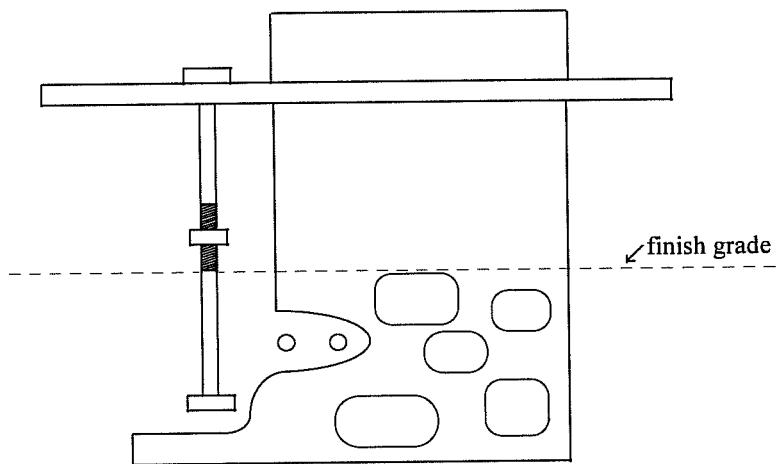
Sheet Metal Shape for Single-Anchor Shear Tests
